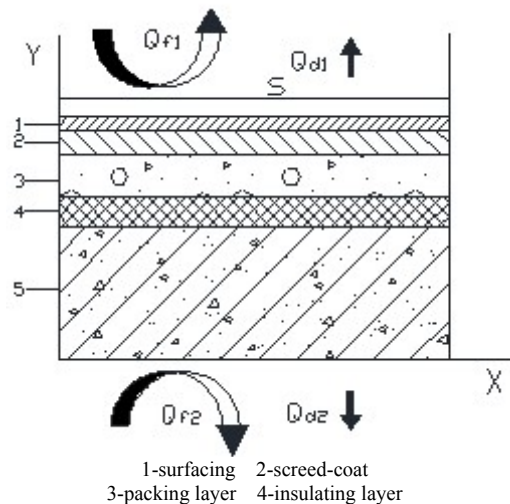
The Floor Layer Structures and the Exterior Heat Transfer Conditions
